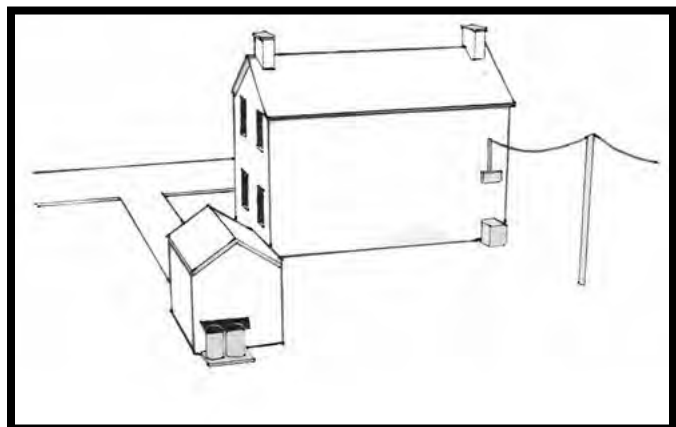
MECHANICAL SYSTEMS AND HVAC UNITS SHOULD BE SITED AT BACK ELEVATIONS.
